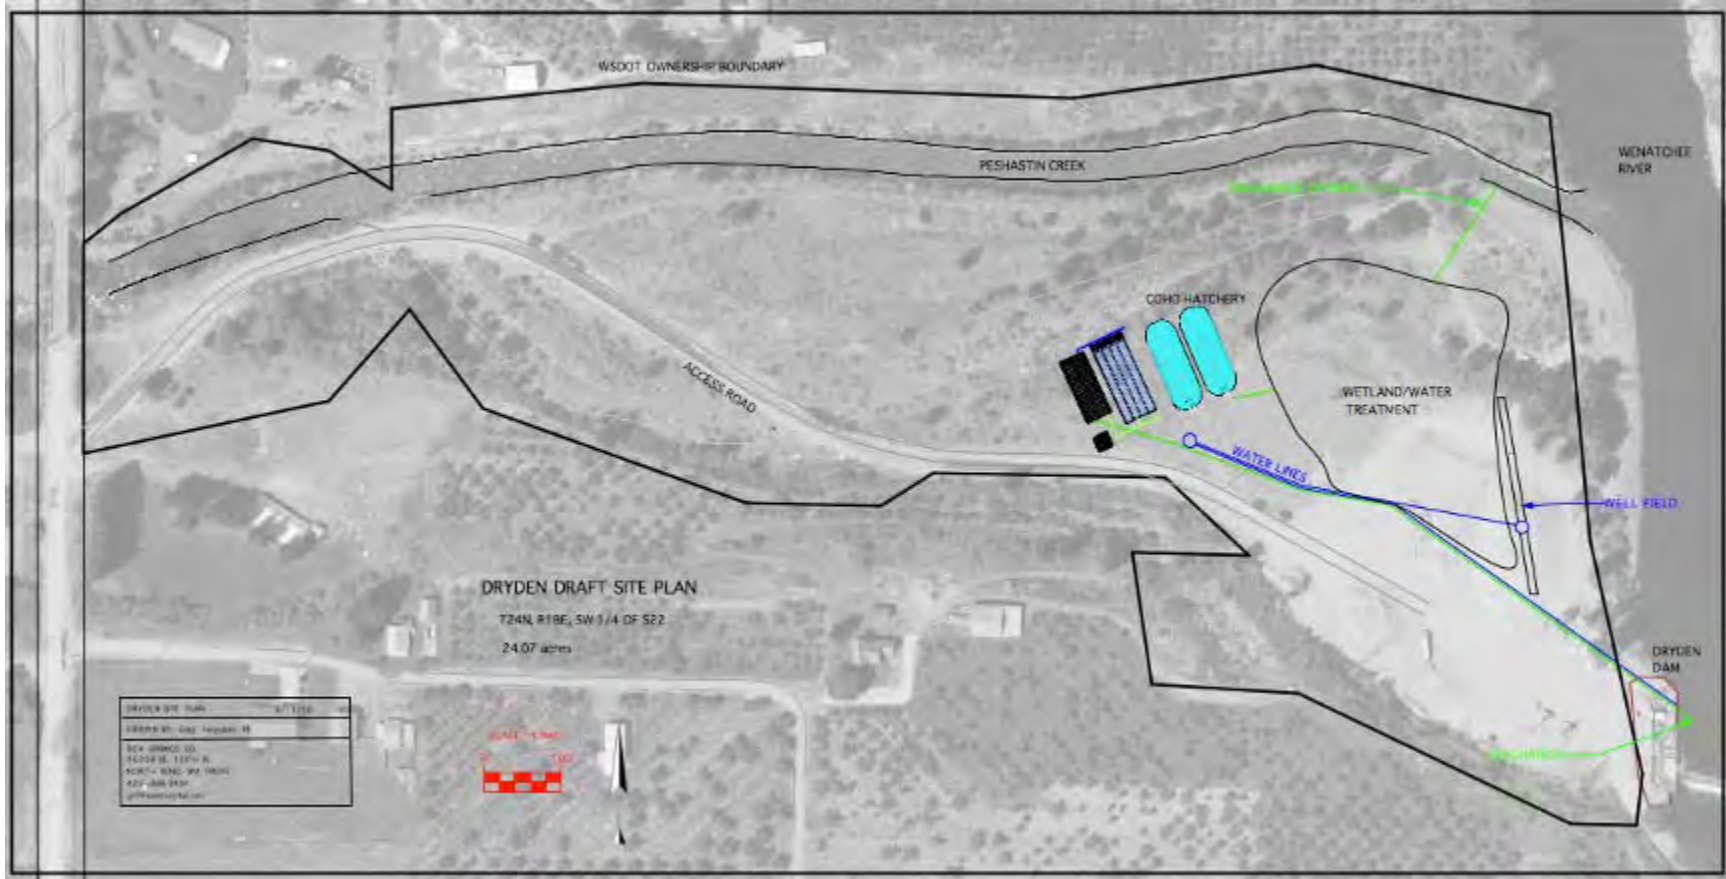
Dryden Draft Site Plan with Aerial Photo
